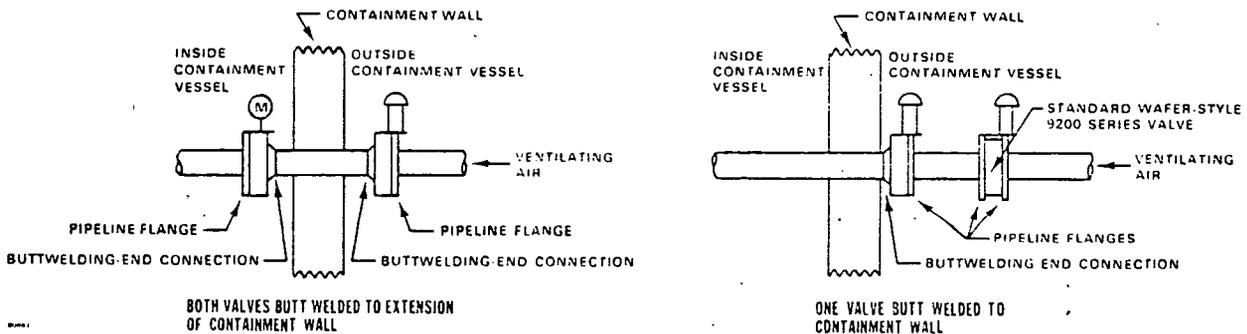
Typical Installations for Single-Flange 9200 Series Valves with One Butt welding-End Connection and One Flanged Connection (Being Used as Isolation Containment Valves in Ventilating Air System)
